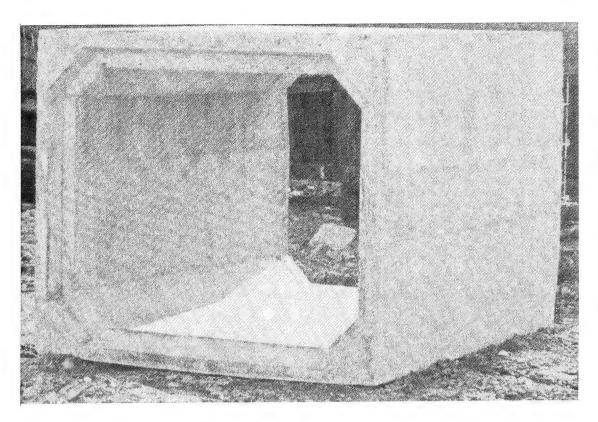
Precast concrete box culvert, Minnesota (from AASHTO 1978)
